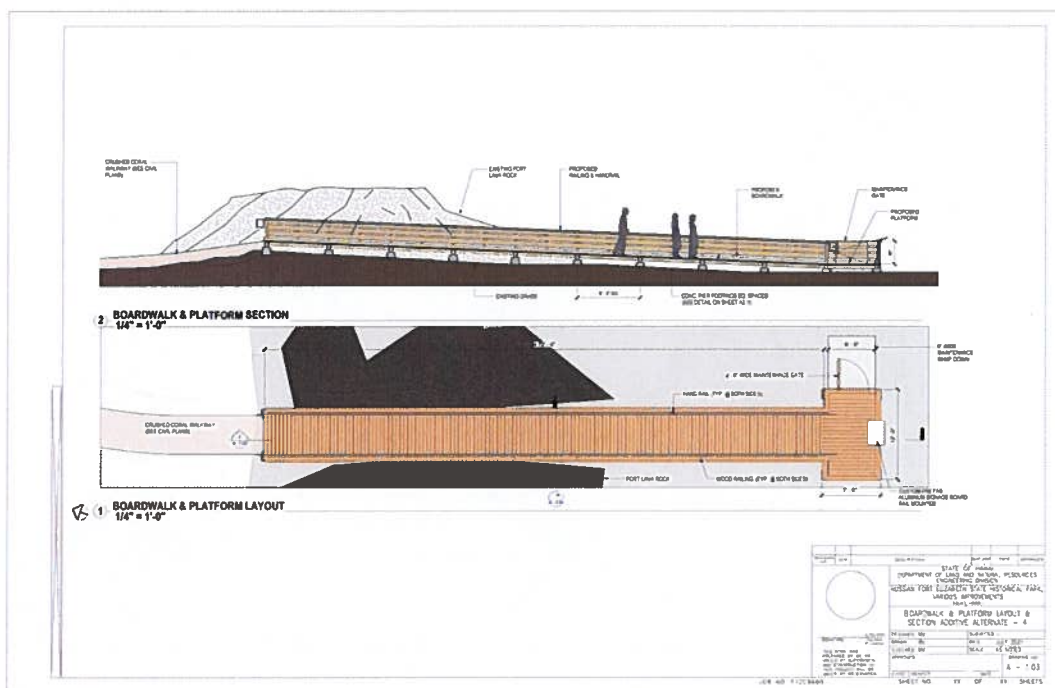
Conceptual Plan and elevation of the proposed boardwalk and viewing platform.
